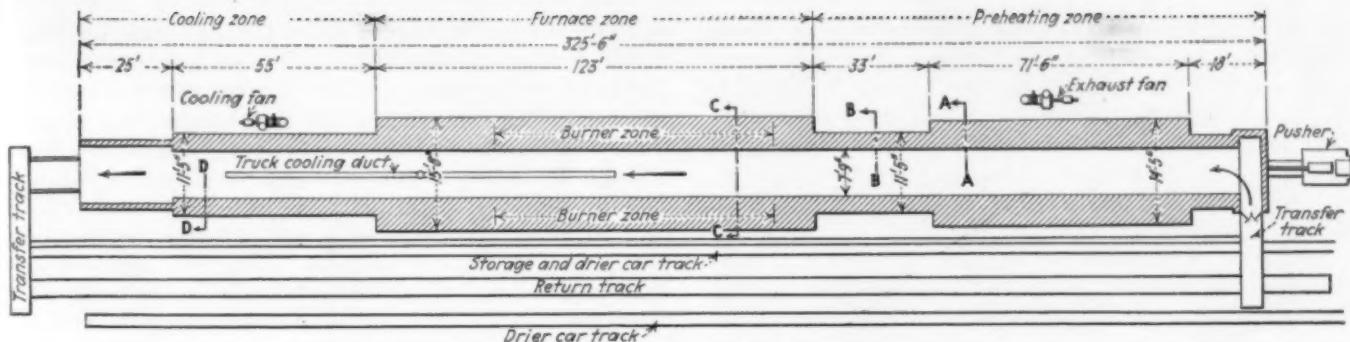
Plan of the Kiln Showing Principal Dimensions
